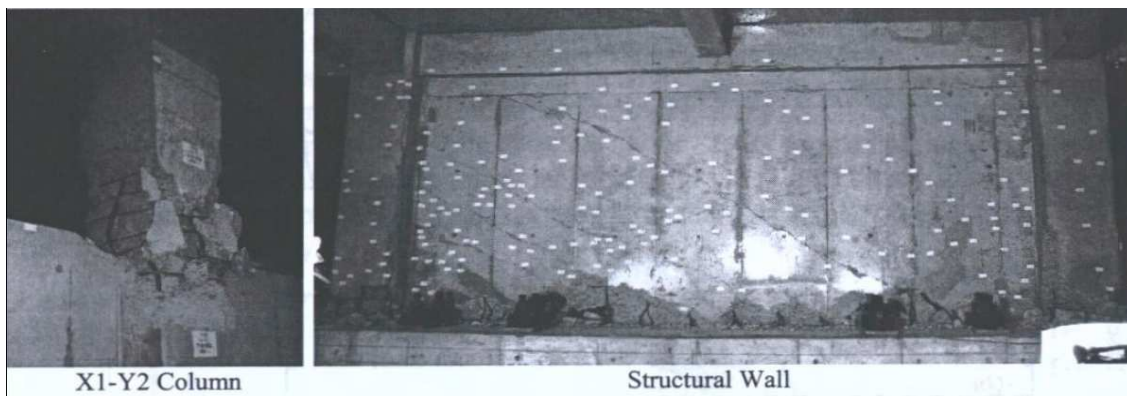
Damage in short columns and shear wall (Shirai et al., 2007)
